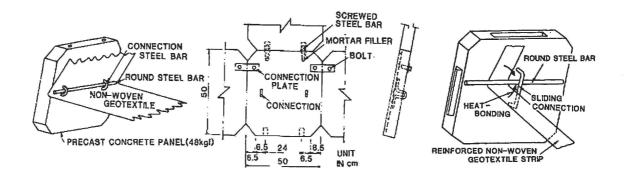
Precast concrete panel (50 cm x 50 cm x 5 cm thick and a weight of 34 kgf); a) the one for Kami-Onda embankment; and b) the one for the Chiba No. 3 embankment (the geotextile sheet or strip connected to each panel was sandwiched between non-woven geotextile sheets used to reinforce the backfill).
